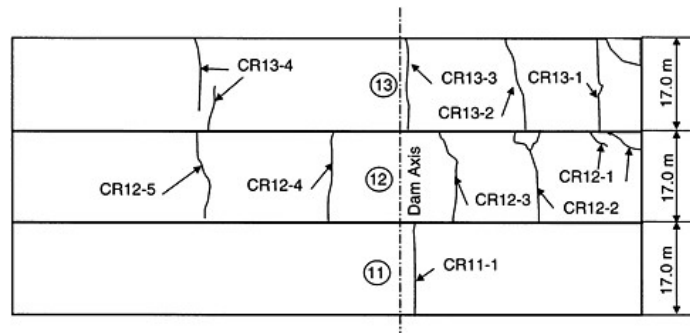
Cracks in base concrete of the dam blocks 11, 12 and 13.
